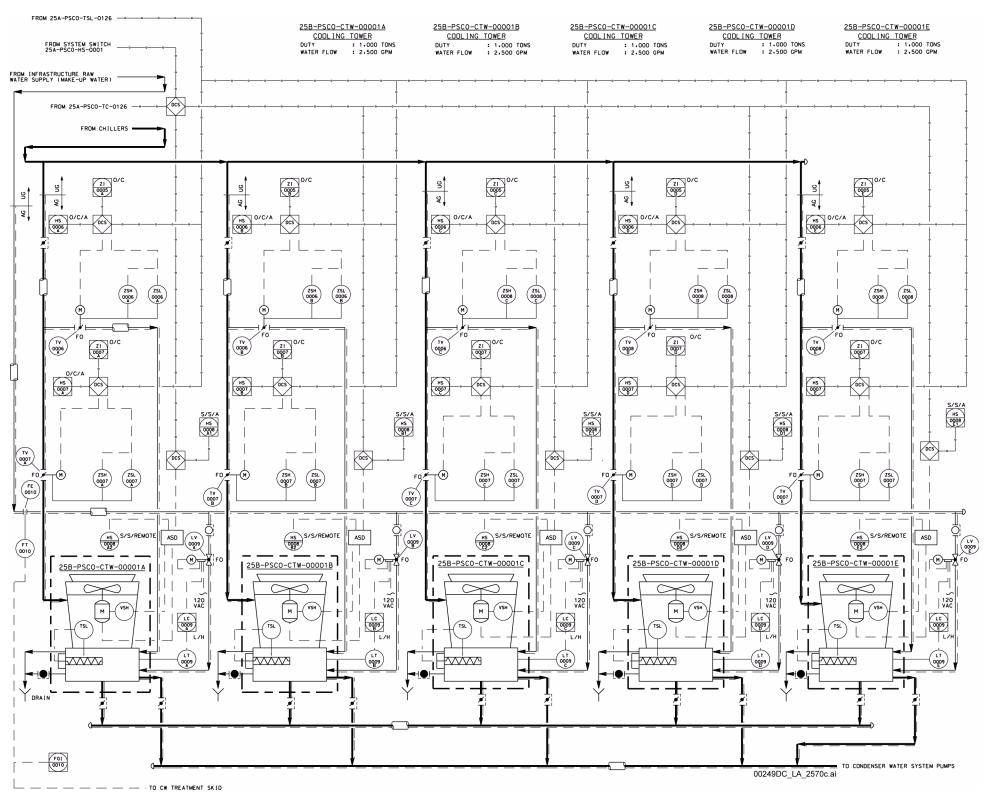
Condenser Water System Cooling Towers Piping and Instrumentation Diagram
